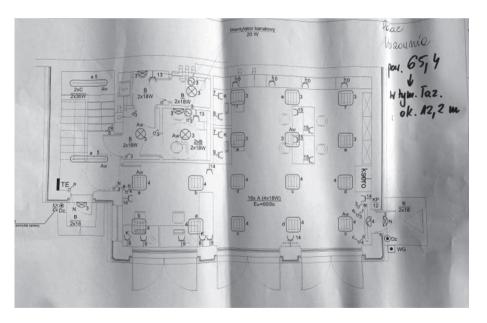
A hall plan of Wozownia Gallery in Łódź, 2020, photo: Wioletta Każmierska-Jerzyk
